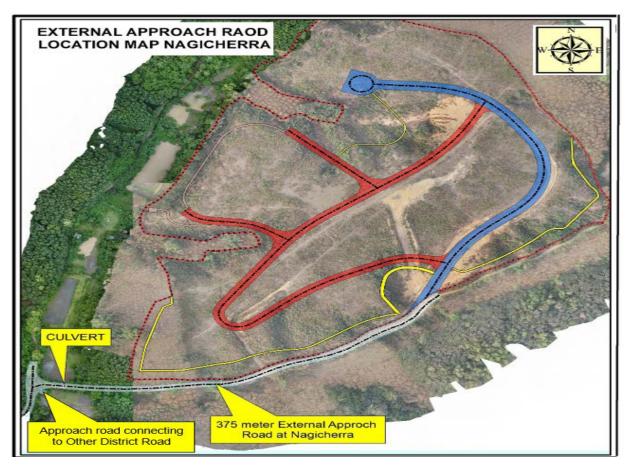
Location Plan of 'Approach Road' qualifying as Associated Facility
